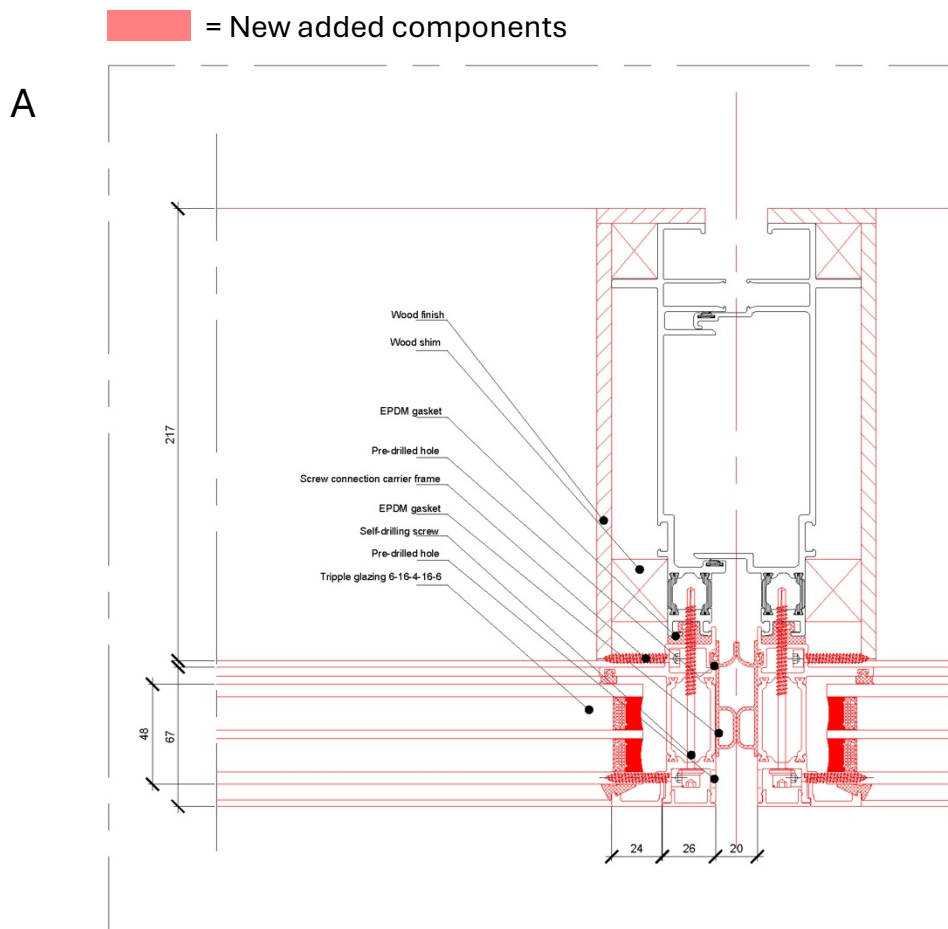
horizontal section mullion-carrier frame (drawing by author).
